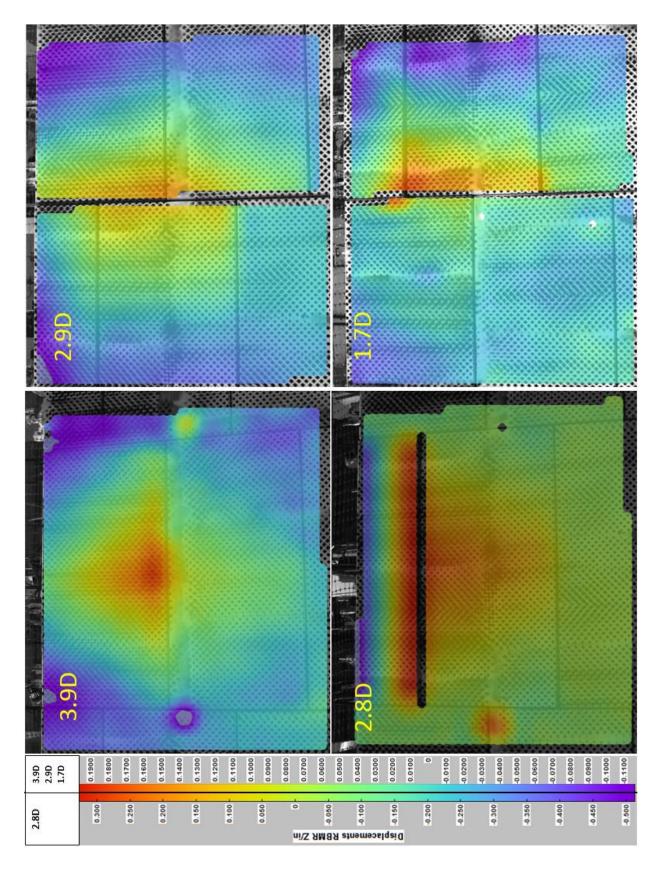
Wall panel displacement at 3.0 in. pile head deflection. Note different scale on 2.8D.
